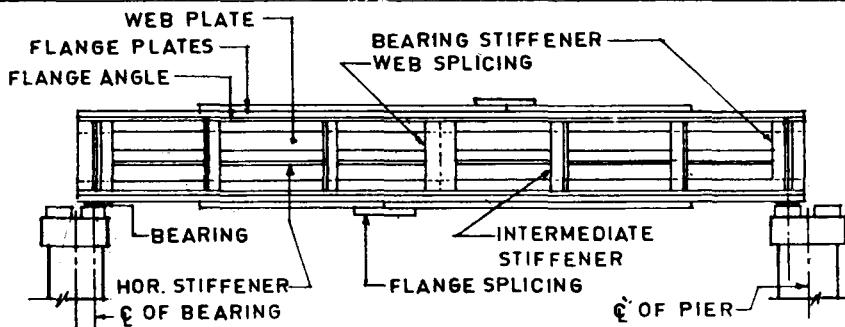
COMPONENTS OF A PLATE GIRDER
